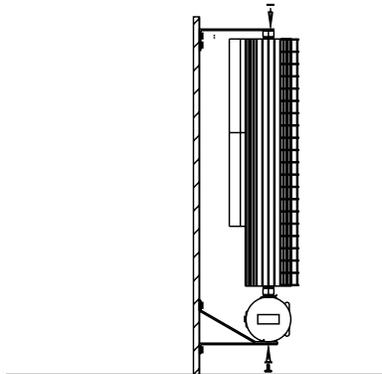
ATTACH HEATER TO MOUNTING BRACKETS
